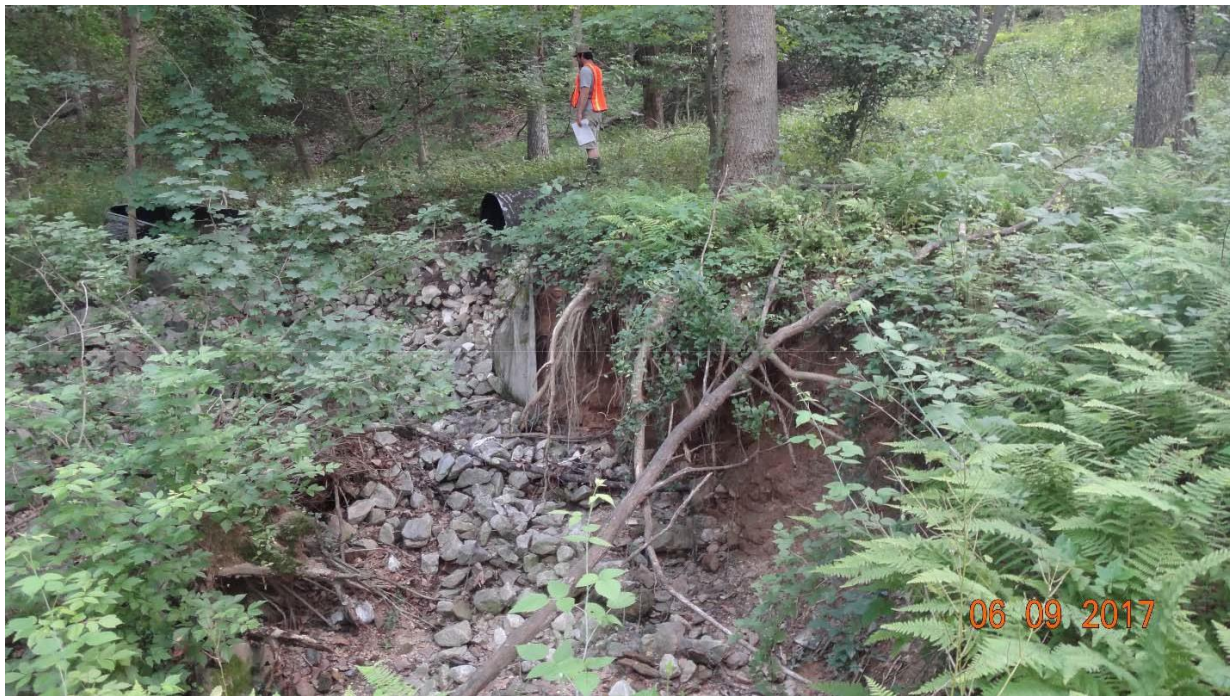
View of the eroded channel, looking toward the outfall pipe (the black pipe seen to the left of the person), which shows damage from soil removal on both sides of the widening channel
